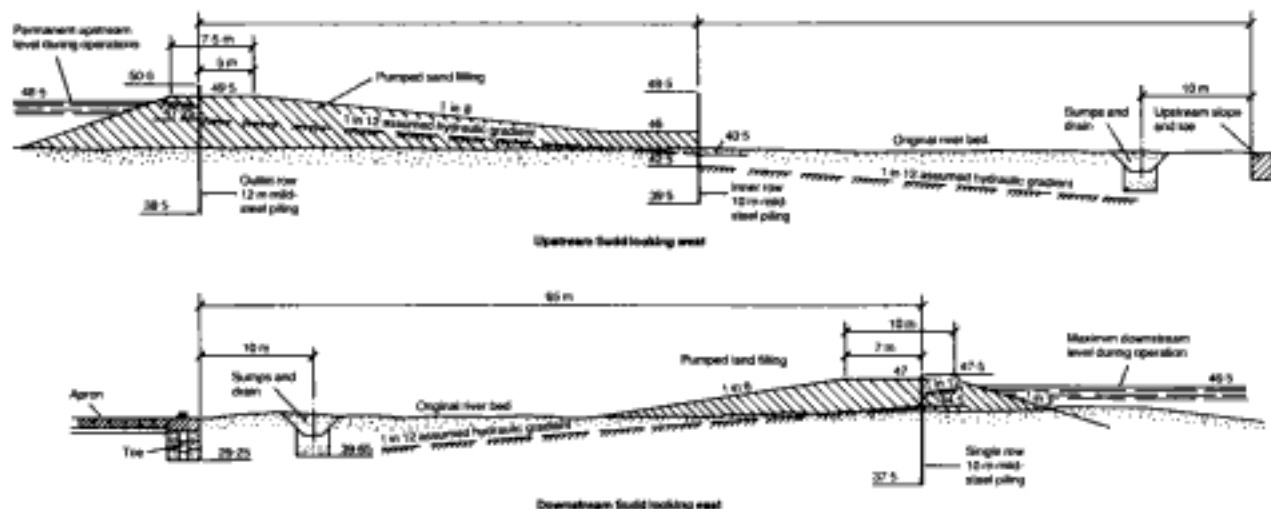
Typical sections, upstream and downstream of suddes for reconstruction of Assuit Barrage, River Nile (Lee²⁰)
